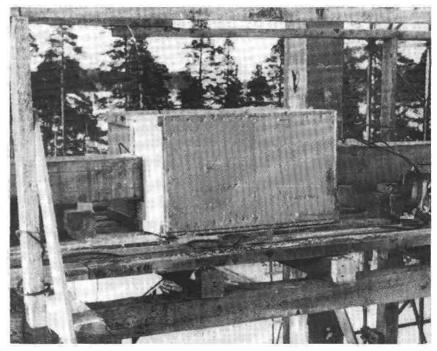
Joints made with cast-in-place concrete require winter protection. This fibreboard box could be heated with a single electric light bulb.
